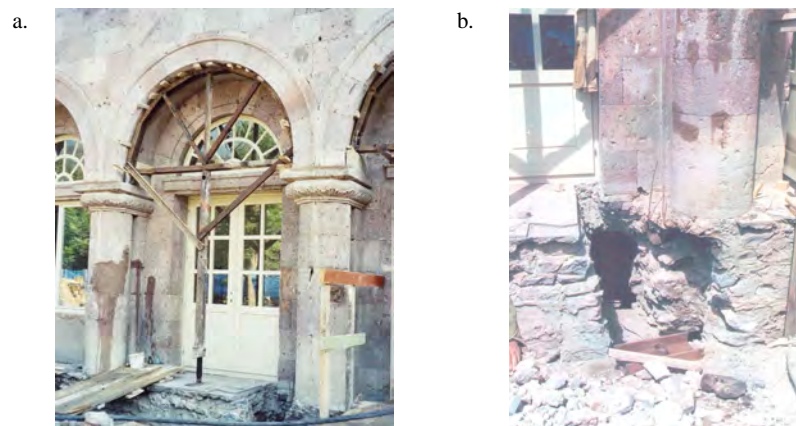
Temporary support under the existing arches (a) and the part of the foundation under the one quarter of the column section is taken out (b)
